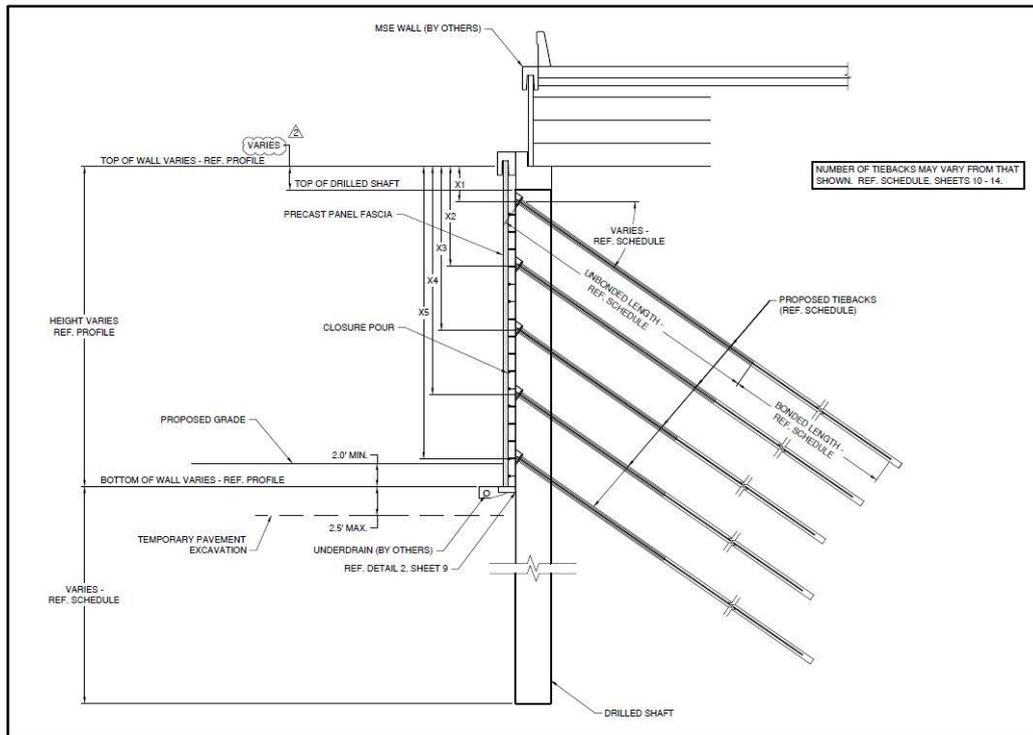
Hybrid Wall: Drilled Shaft with Tie Backs + MSE on the top part
